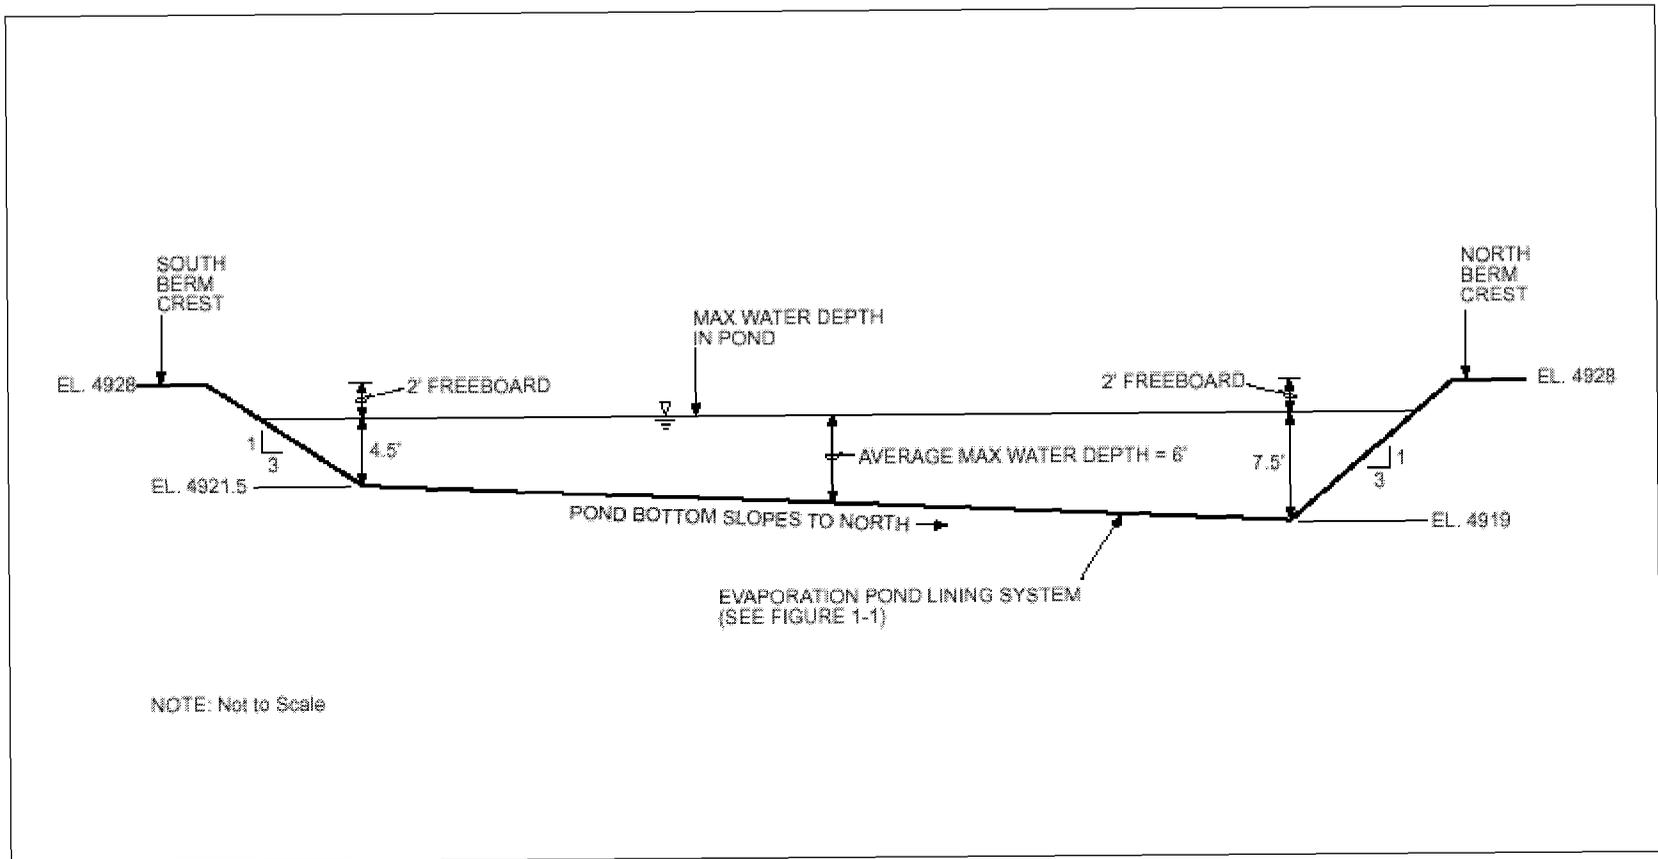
Evaporation Pond Lining System Water Depth (N-S Cross-Section).
